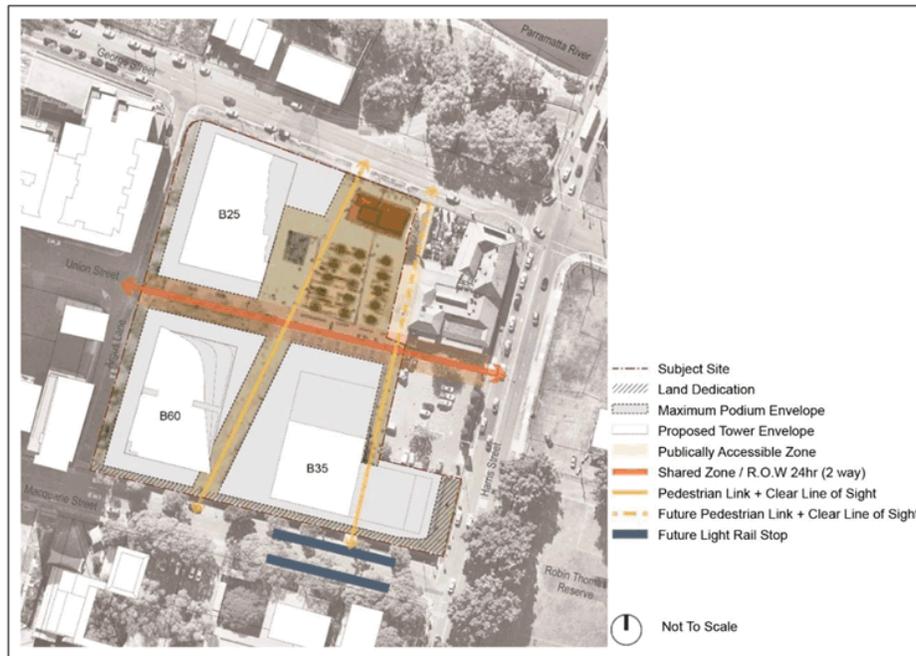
Master plan diagram for 142-154 Macquarie Street
